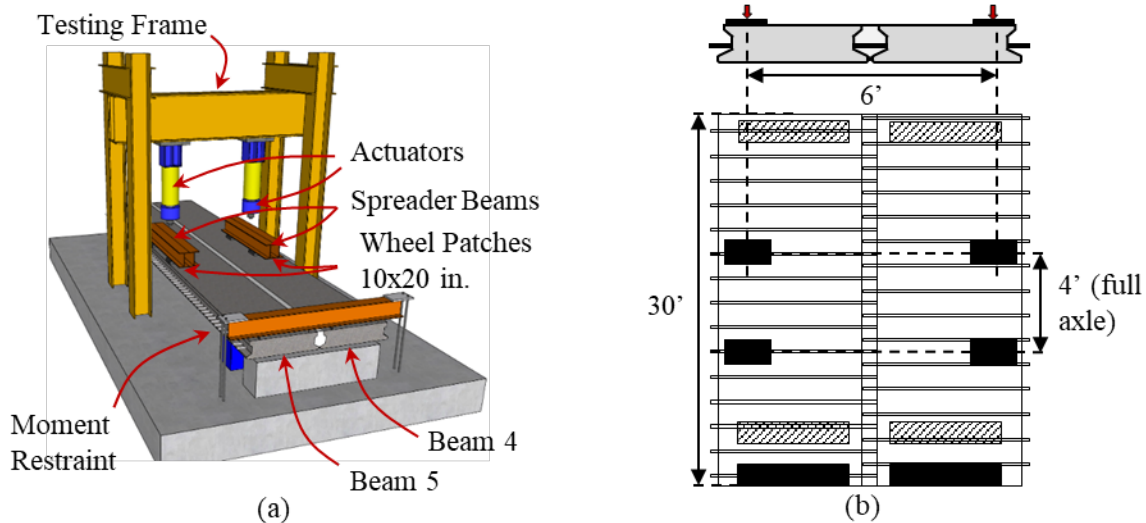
Proposed test setup for Configuration 2-7 (a) schematic and (b) plan and elevation views
